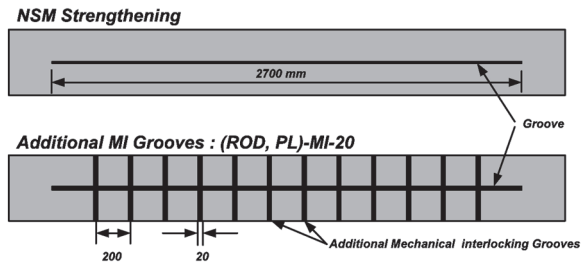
Bottom schemes of RC beams strengthened with NSM reinforcement (mm)
